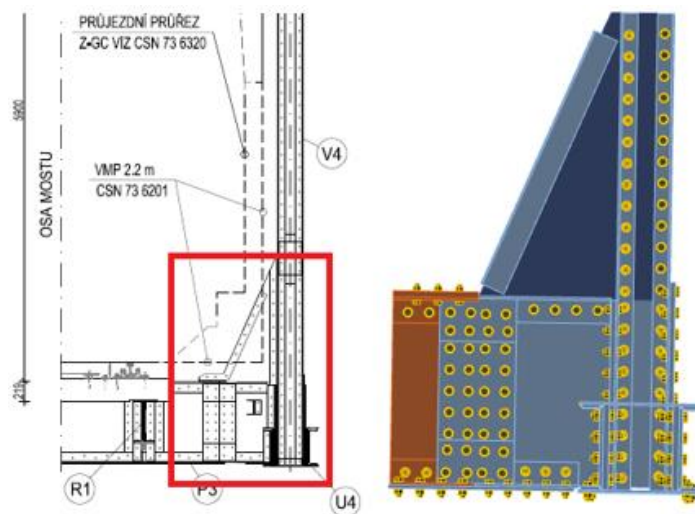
Joint of interest on TU 2101. Main girder with the cross beam. Ref. [16]
